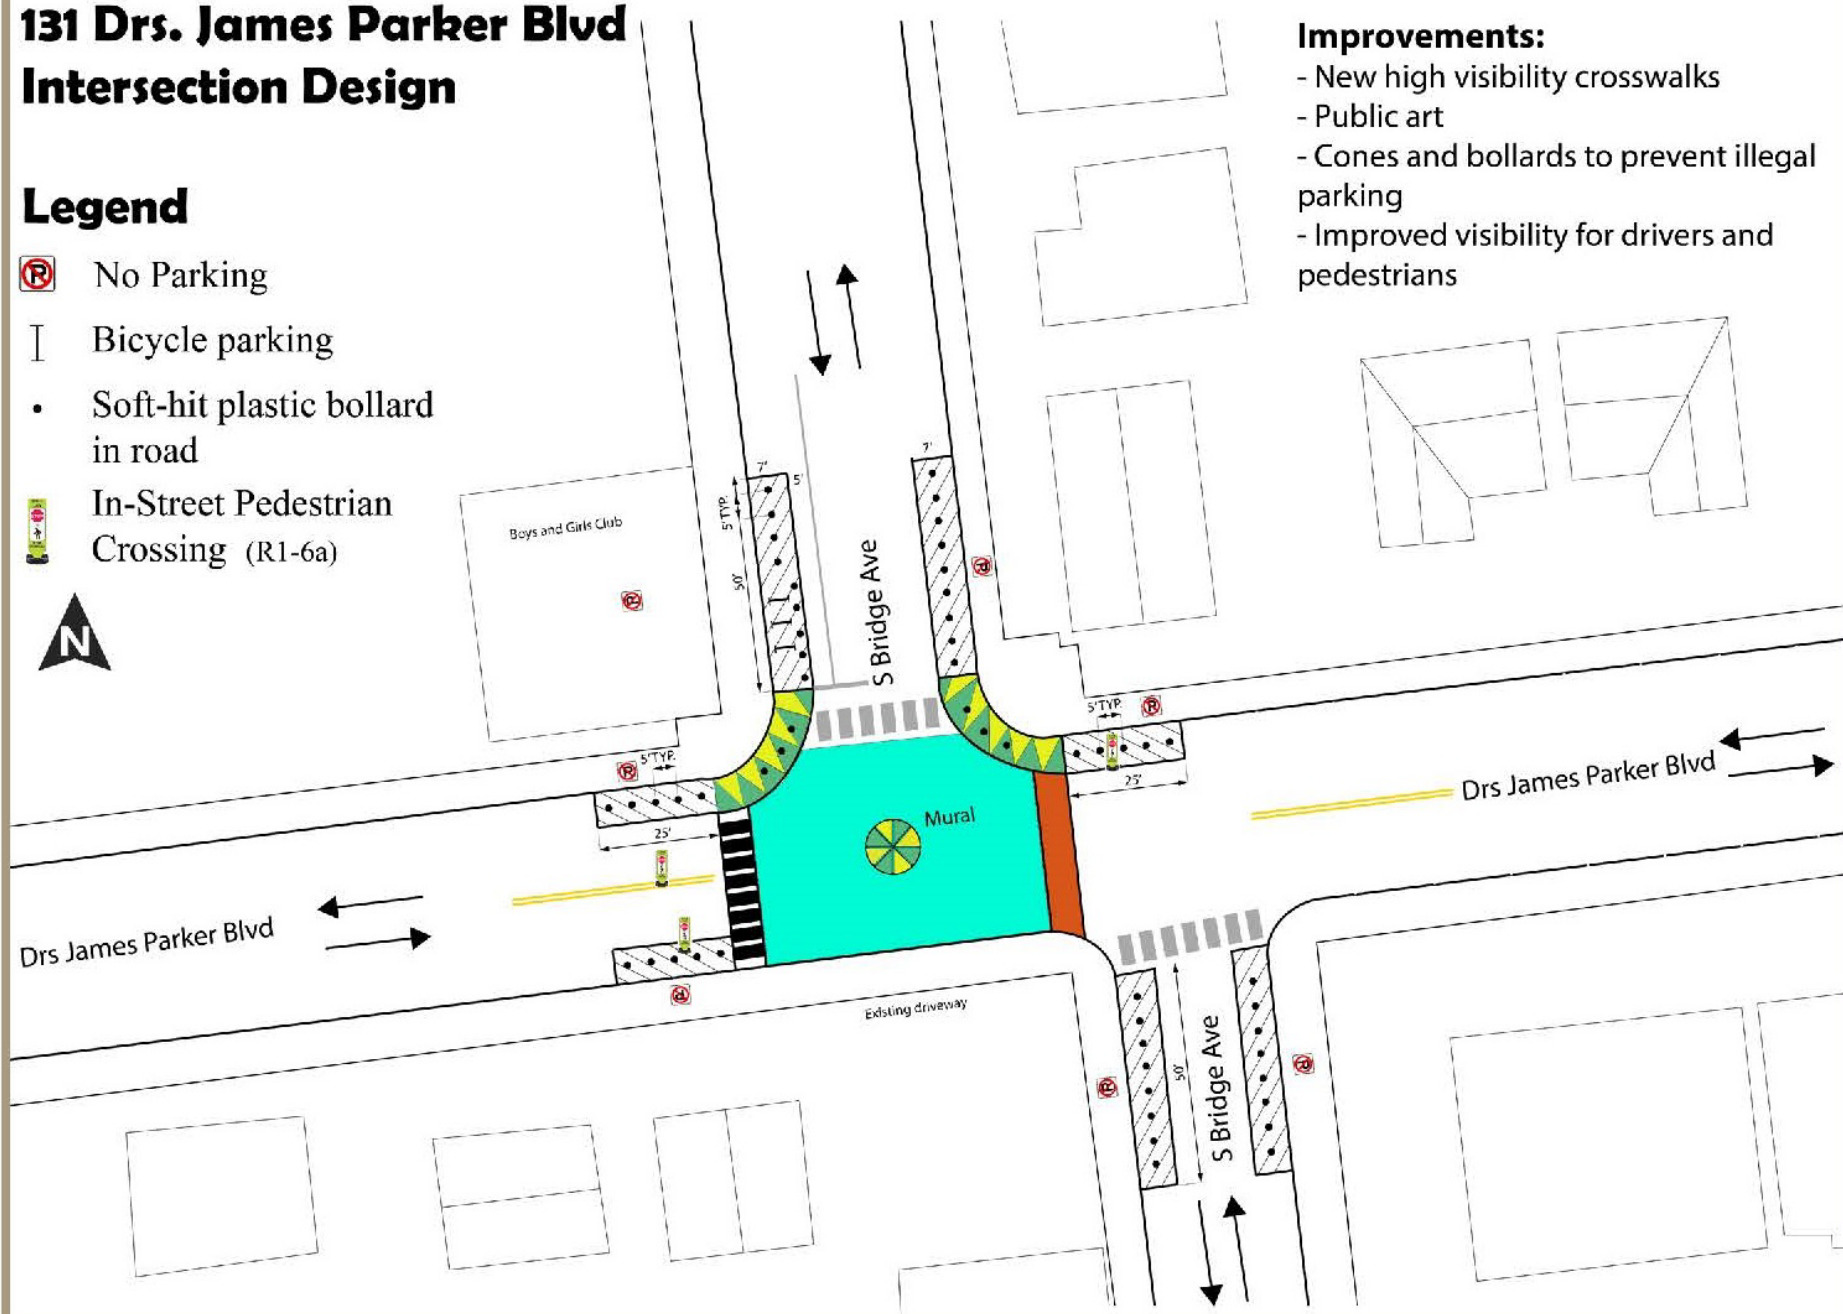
Intersection design for the Drs. James Parker Boulevard and South Bridge Avenue Demonstration Project.
